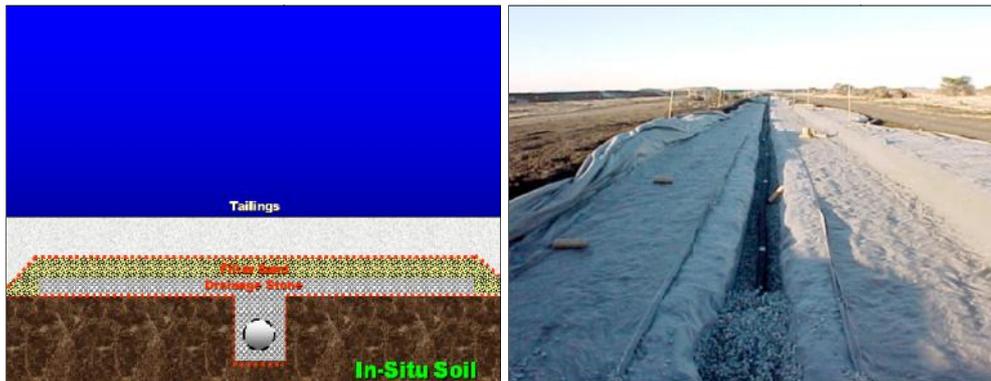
Geotextile used as a filter medium below the toe drain of tailings dam
